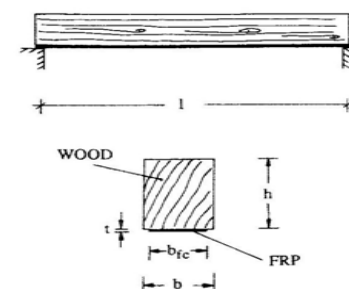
Wood Beam of Span  $l$  Reinforced with FRP Sheet and Cross-Sectional Properties
